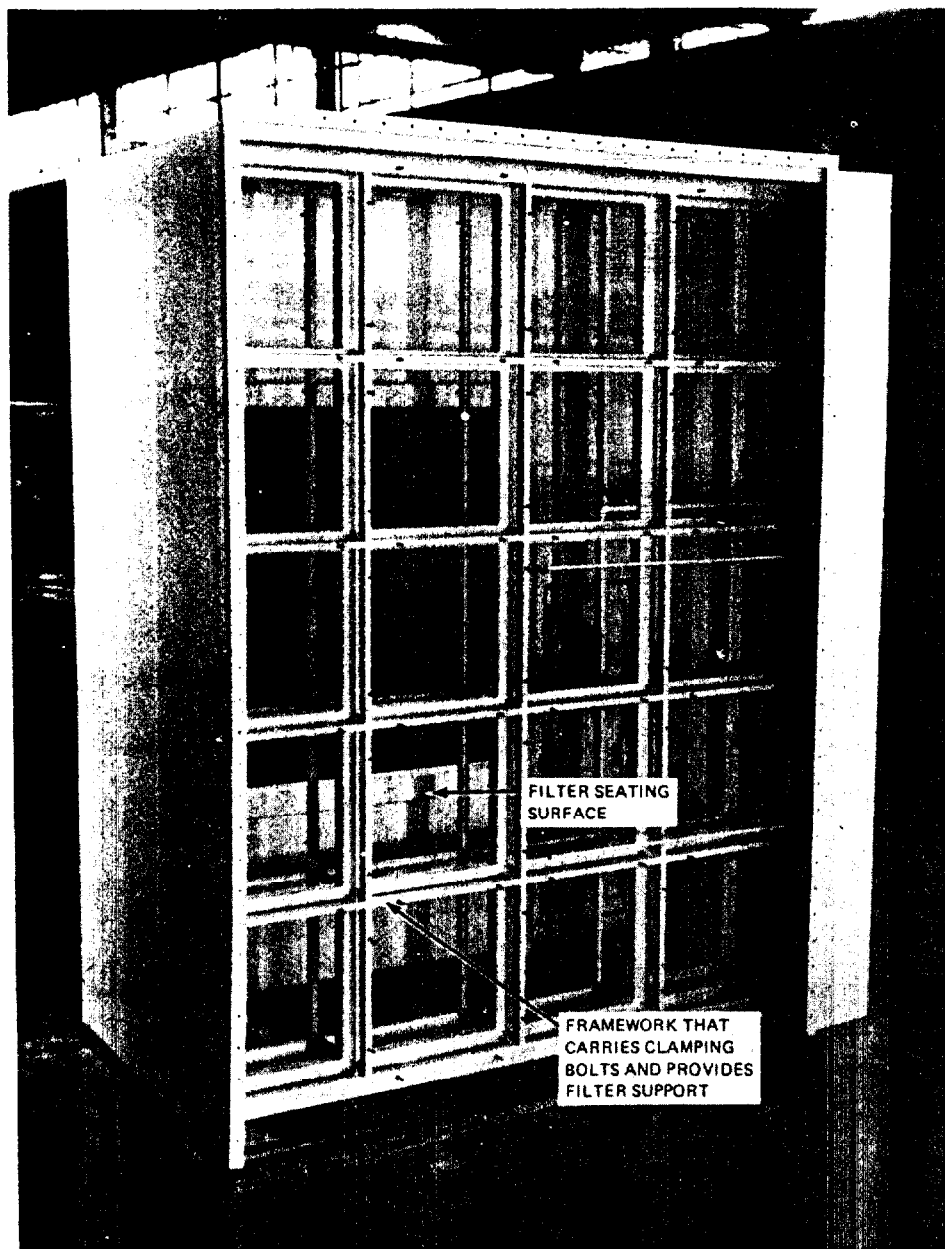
Two-part, face-sealed HEPA-filter mounting frame. Filters seal to rear frame. Front frame provides filter support during maintenance and carries clamping bolts. This arrangement permits shorter clamping bolts (which decreases the possibility of misalignment of bolts during maintenance). The arrangement also prevents the bolts from being welded on or penetrating the primary frame to which the filters seal. The 4-wide by 5-high array is poor from the standpoint of maintainability; a service gallery at the third filter level would be desirable. Courtesy MSA Research Corp.
